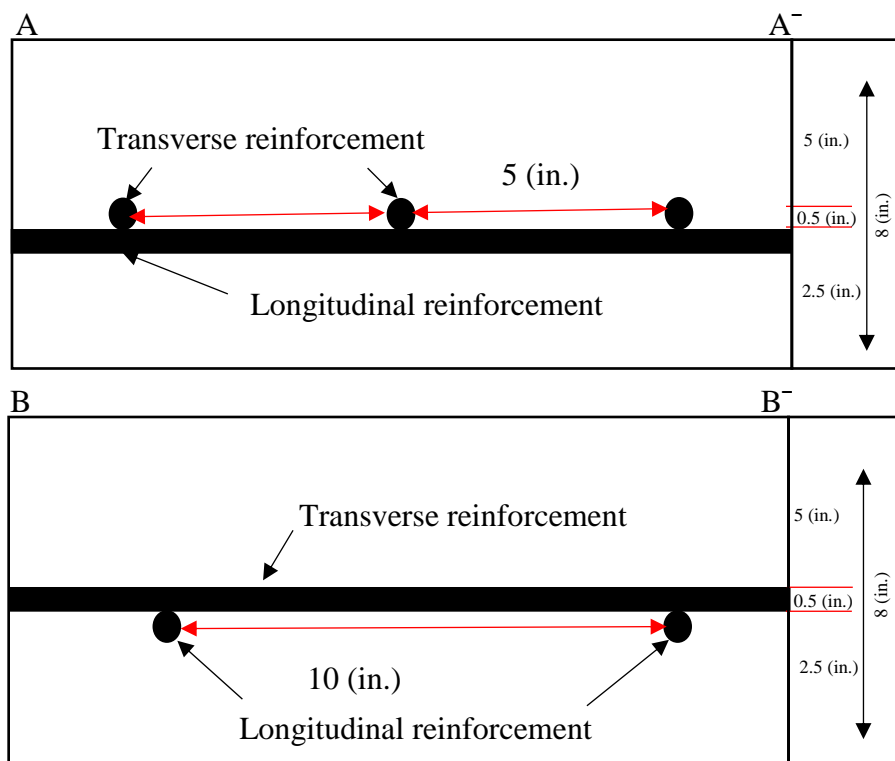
Longitudinal (A A⁻) and transverse (B B⁻) cross sections of the bridge deck showing reinforcement details.
